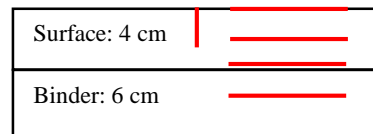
Test slab model layout (surface layer of the BRENNERO pavement design) with delamination locations
